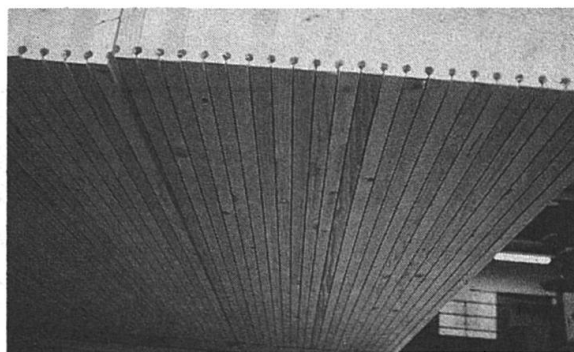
Prefabricated vertical-nailed planks elements with an acoustic profile.
